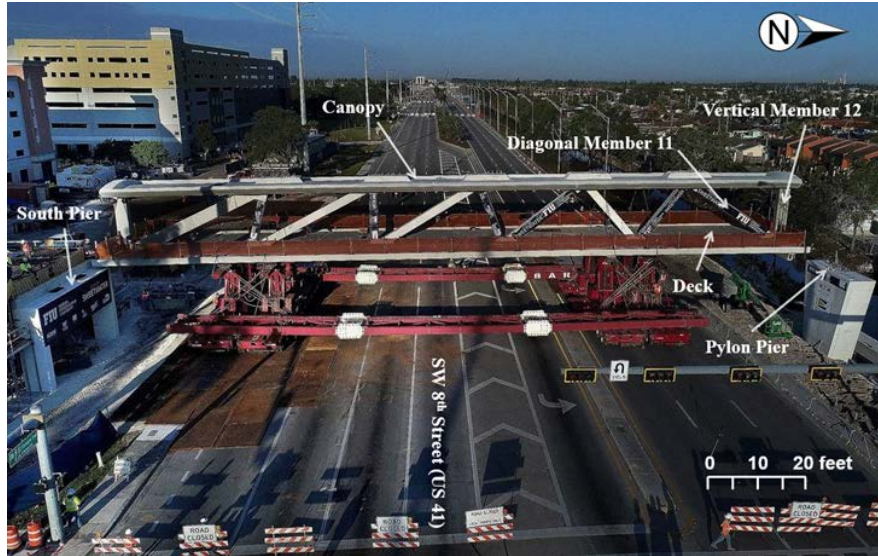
Main span being moved on March 10, 2018, prior to placement on the south pier and north pylon pier, looking to the west, labels added by the NTSB. (Source: Internet)
